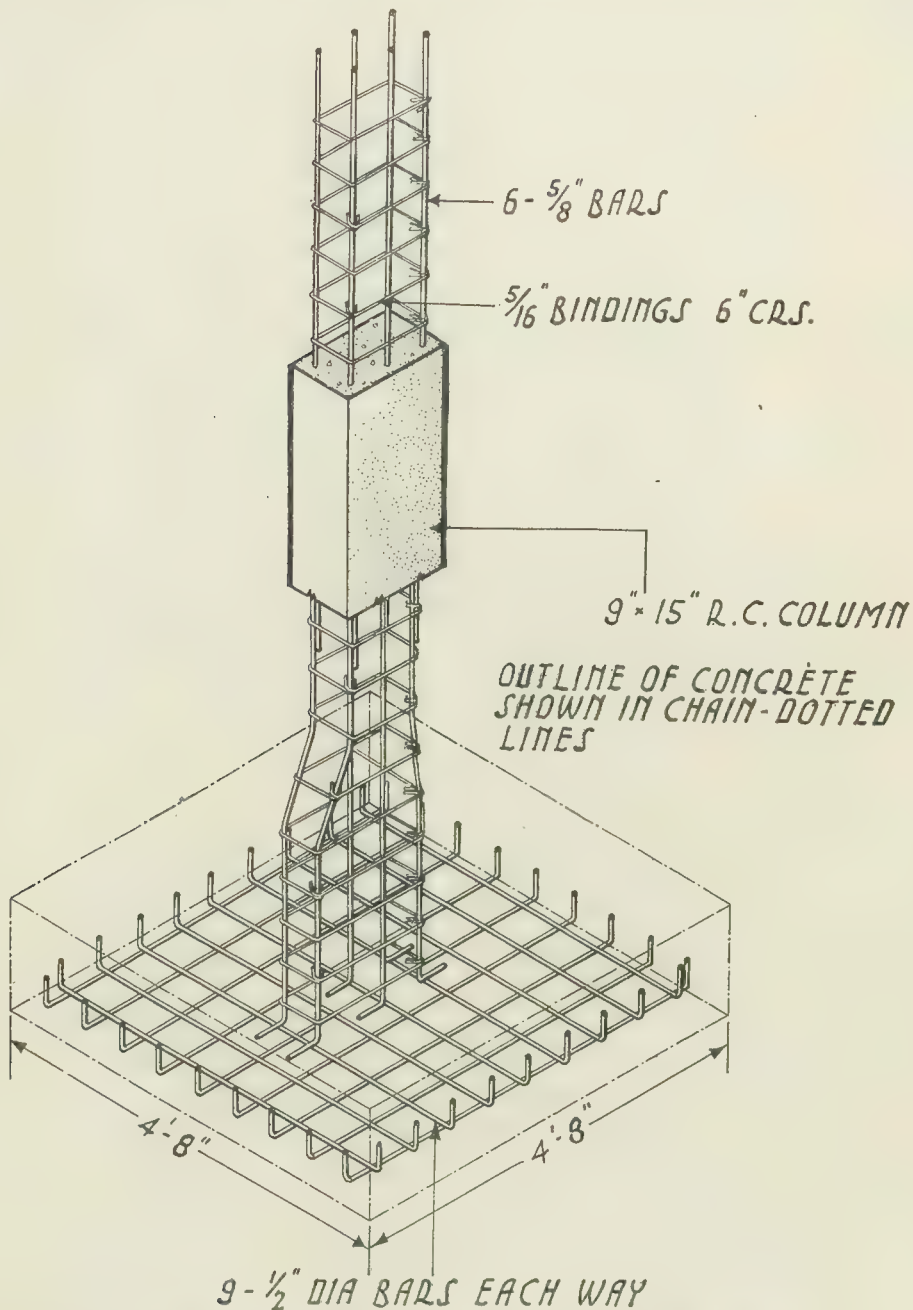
ARRANGEMENT OF STEEL REINFORCEMENTS FOR COLUMN AND BASE
